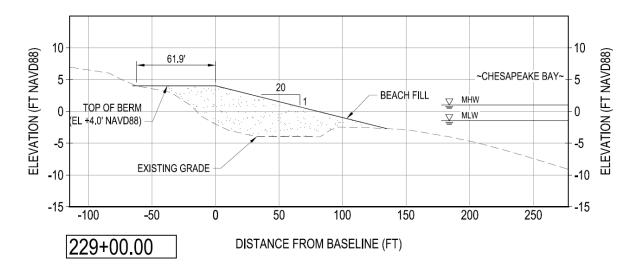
Typical beach profile showing existing grades and proposed nourishment construction in Reach 3 (STA 229+00)
